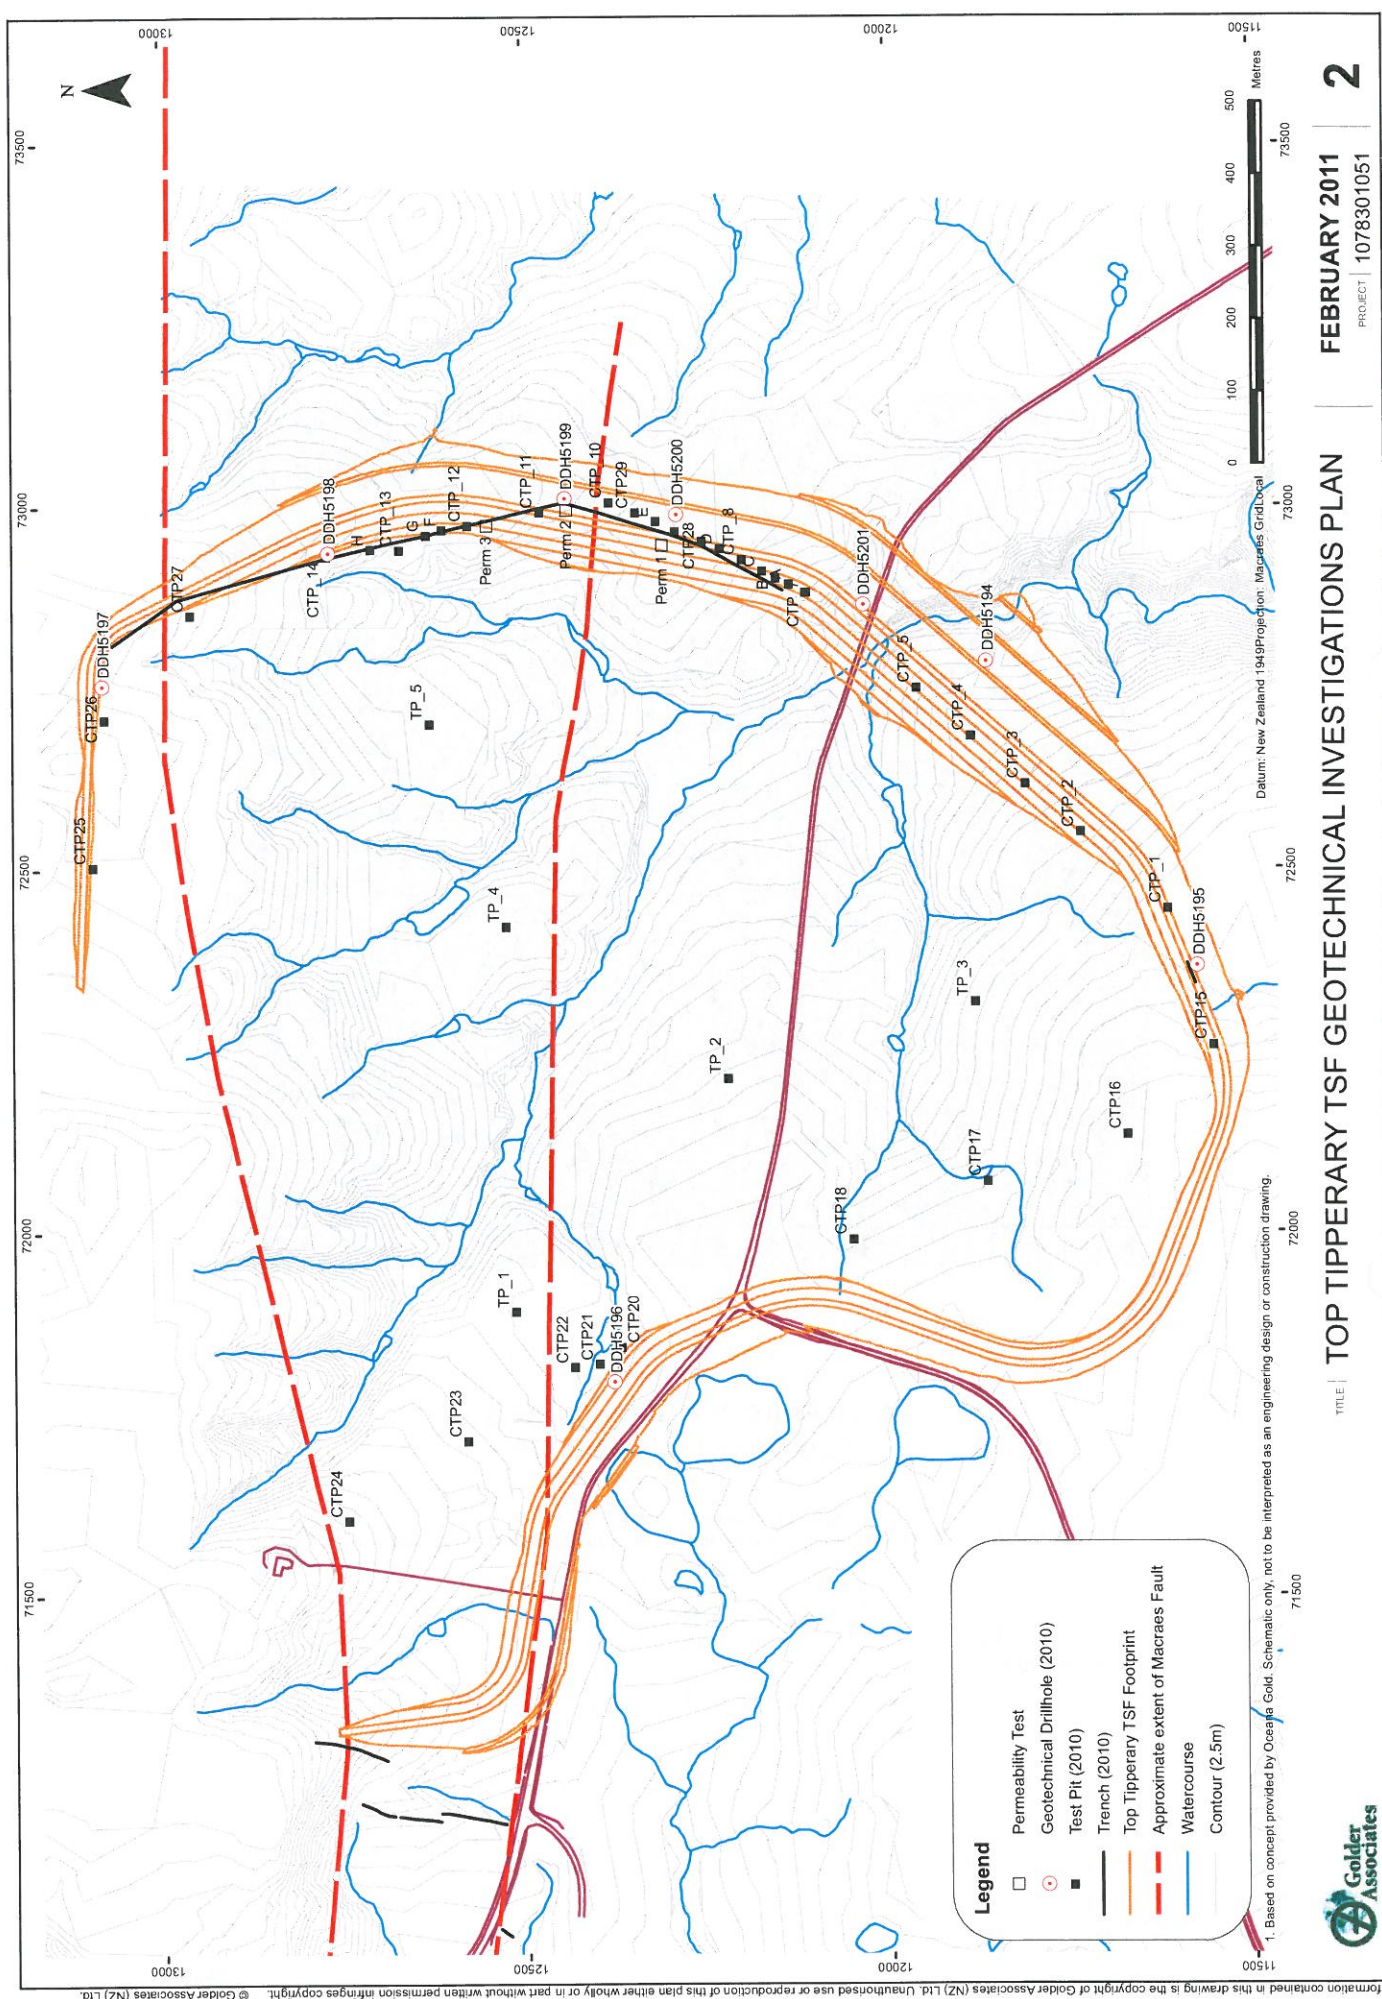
Layout plan and location of Top Tipperary Tailings Storage Facility.
